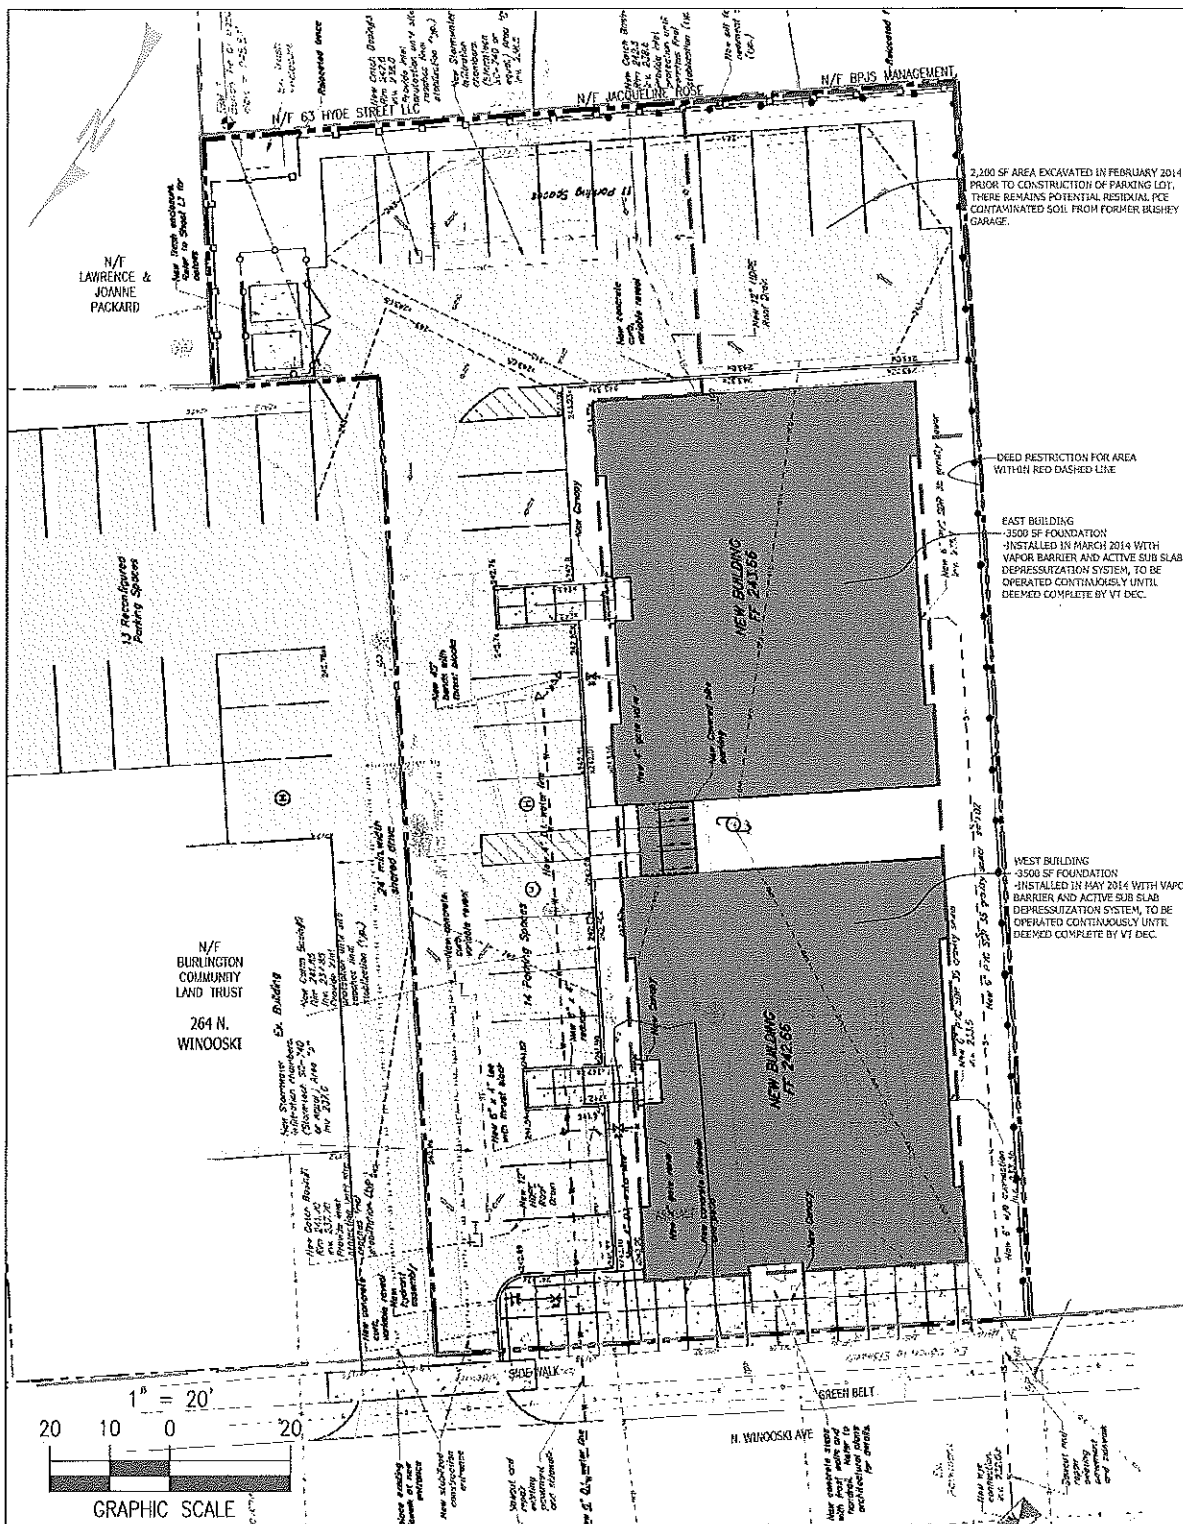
EXHIBIT: CORRECTIVE ACTION SITE PLAN
